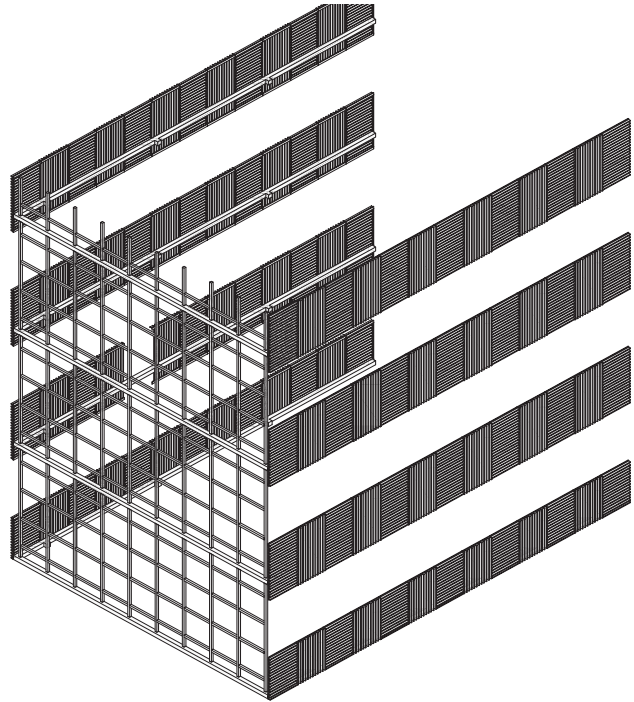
Fixed Elements; the perspective shows the fixed elements of the façade, the handrail and the lattice, connected to its structure.
